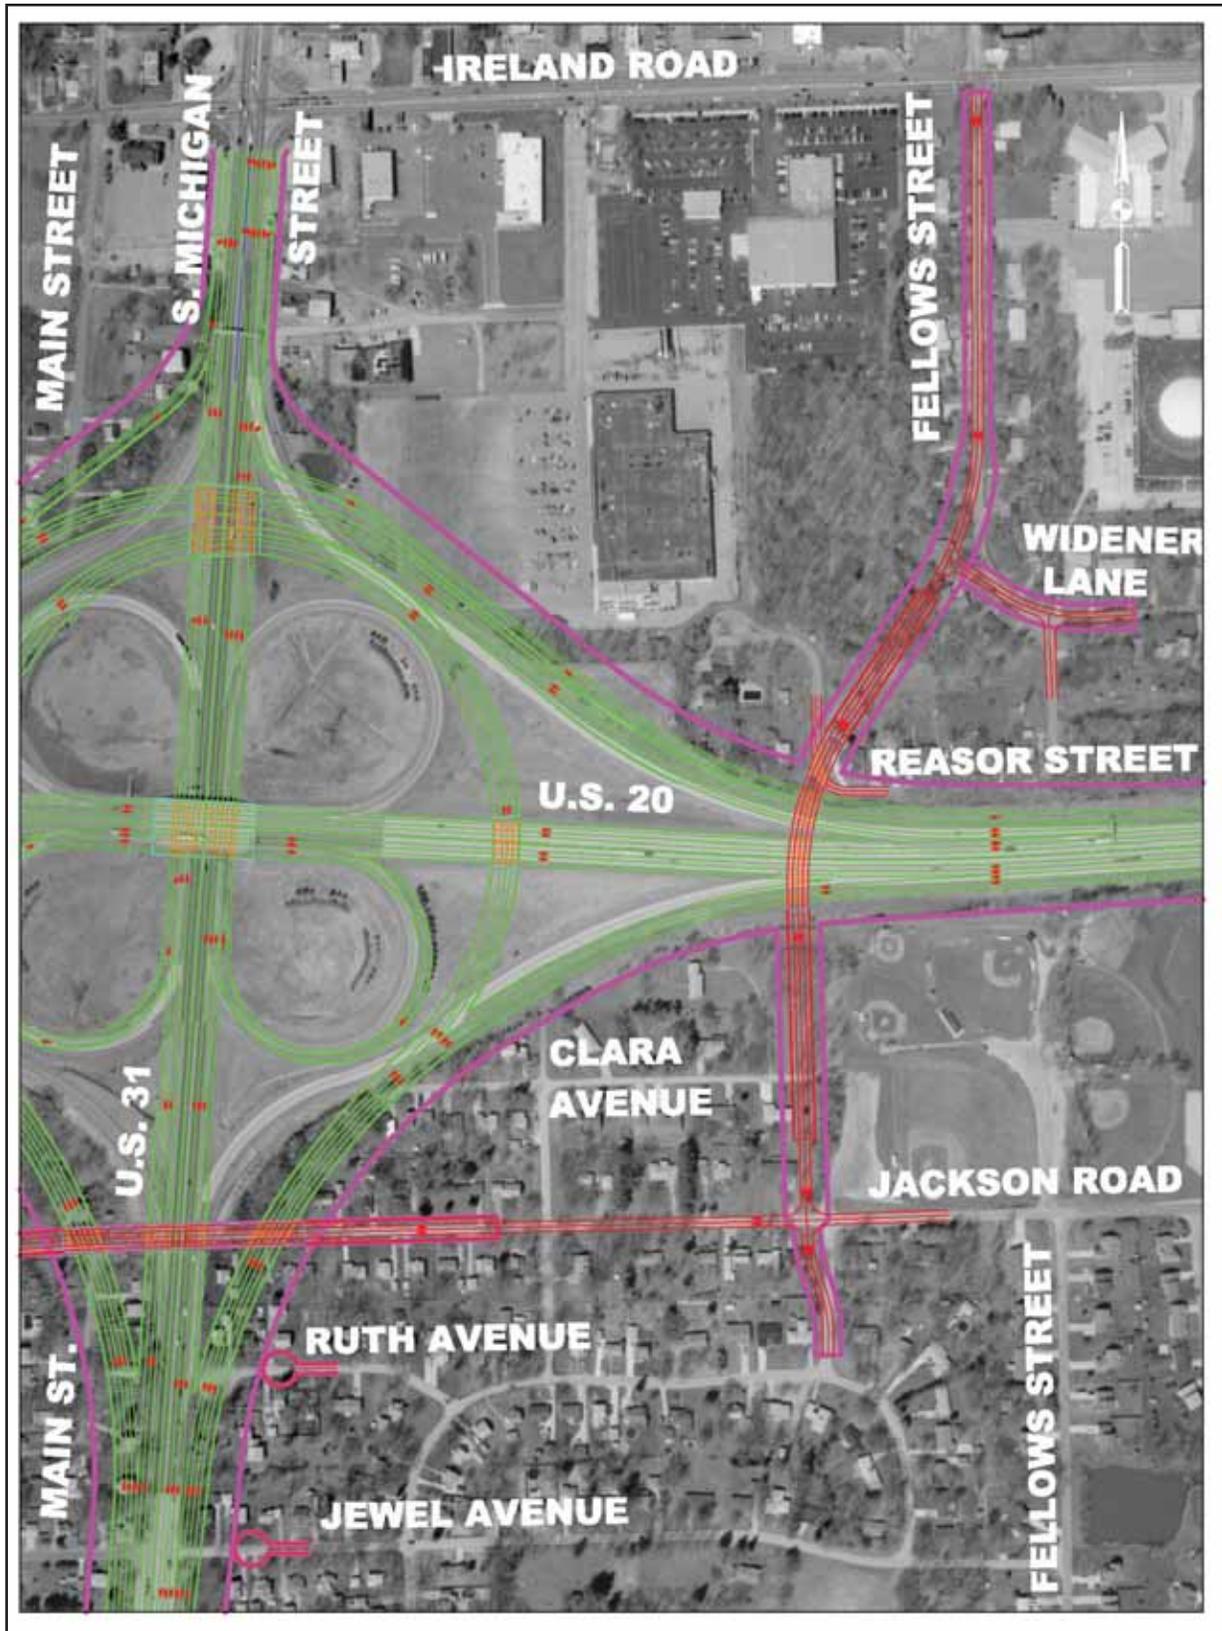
Fellows Street Extension Local Roadway Improvement Project
